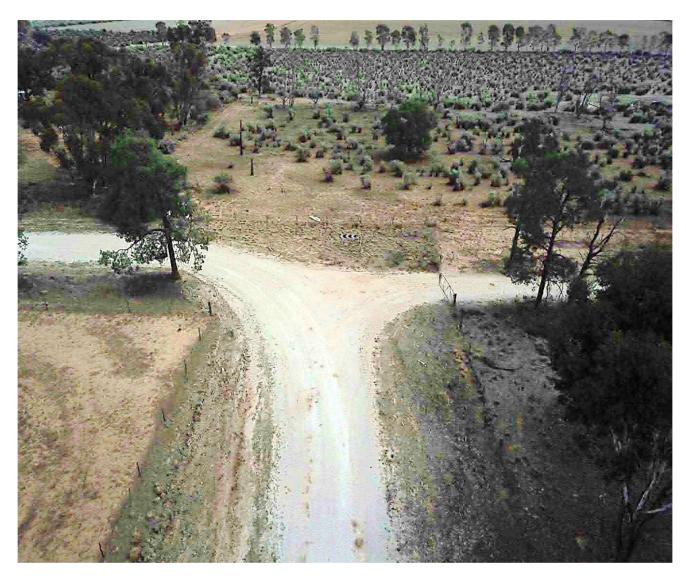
Approximate location of proposed site entrance at Muntz Road looking west
